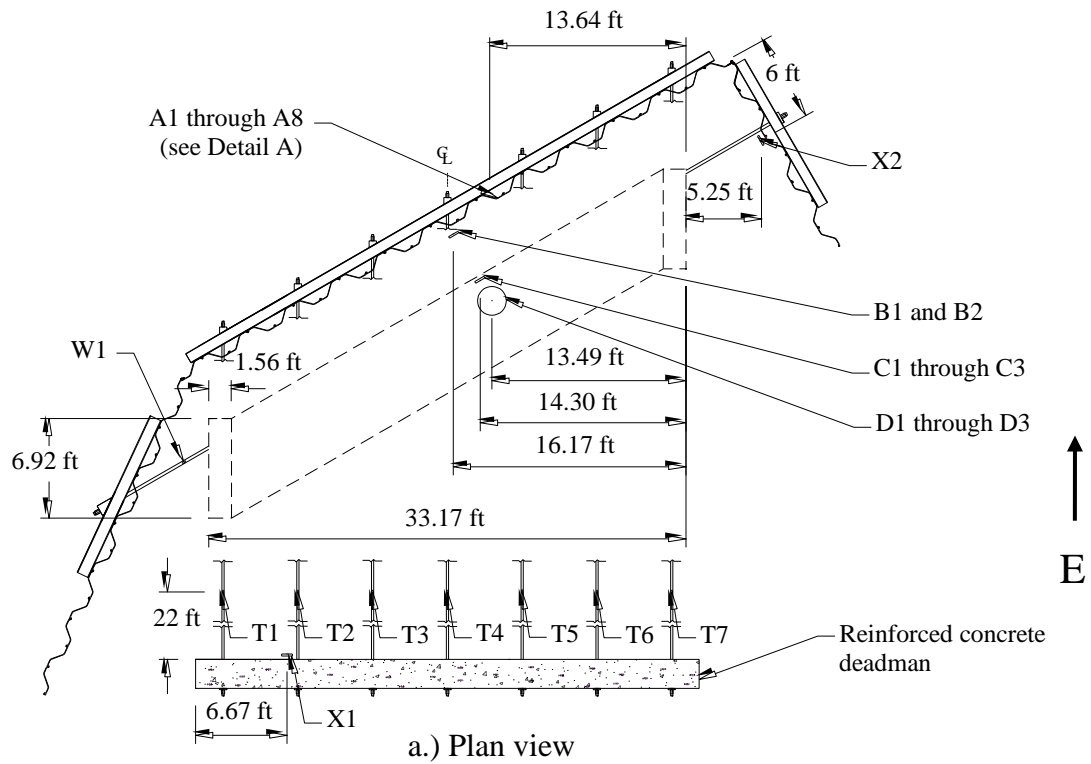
Location of instrumentation in west sheet pile abutment system in BC, Iowa
